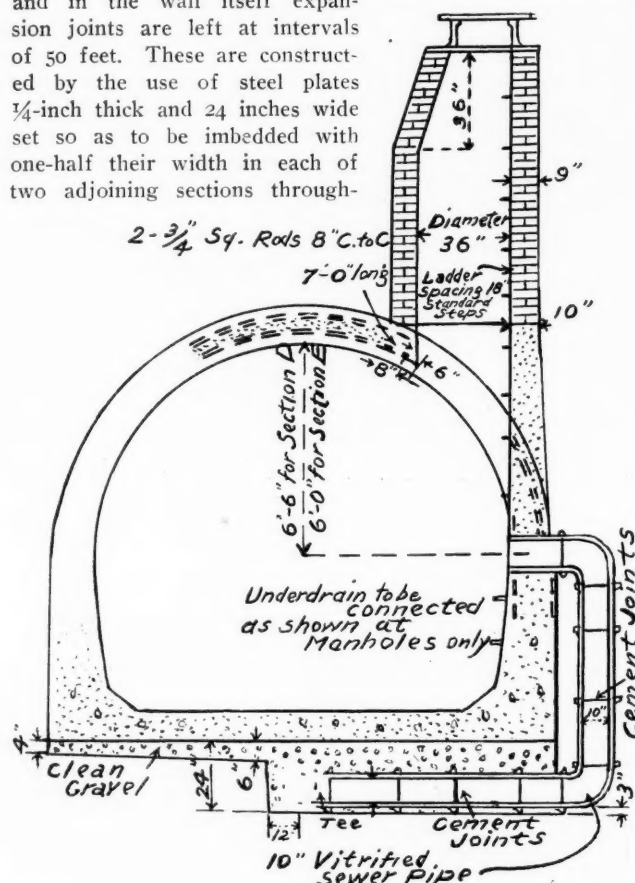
BASKET-HANDLE SECTION, SHOWING MANHOLE AND SUB-DRAIN CONNECTION
